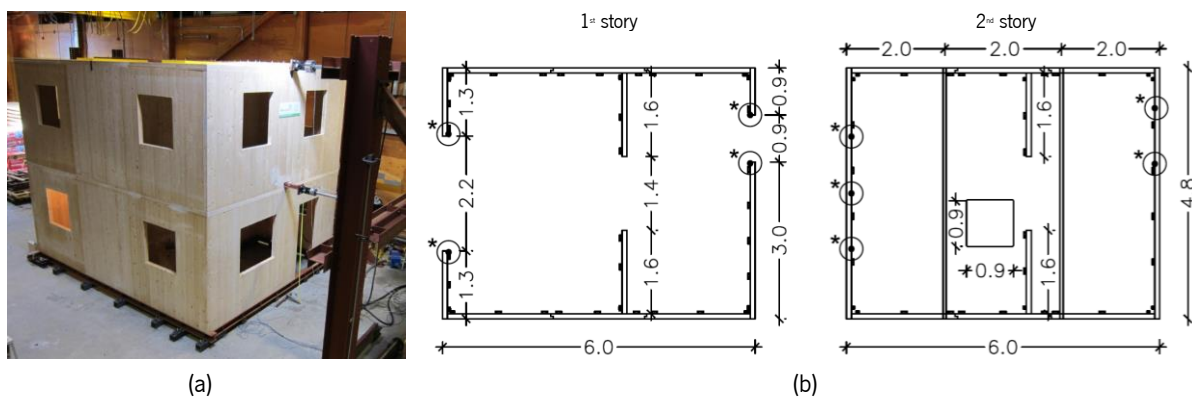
Panoramic image (a) and plans (b) of a quasi-static tested 2-story building [27, 28].
